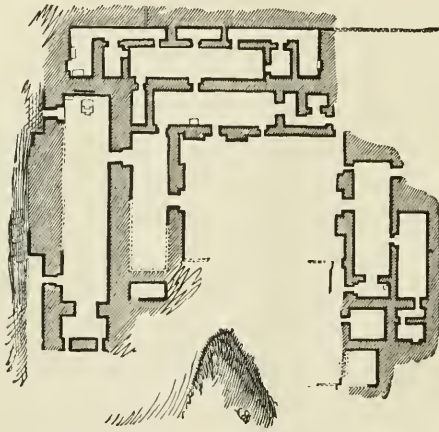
Ground Plan of the Northwest Palace of Nimrud.
